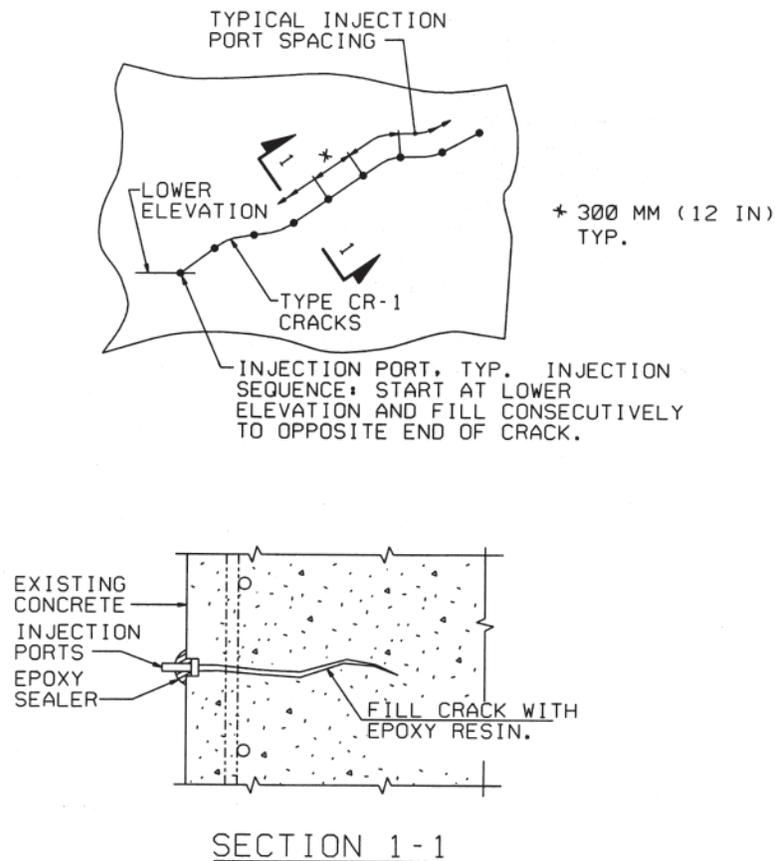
Typical Structural Crack Injection (FHWA, 2005b)
